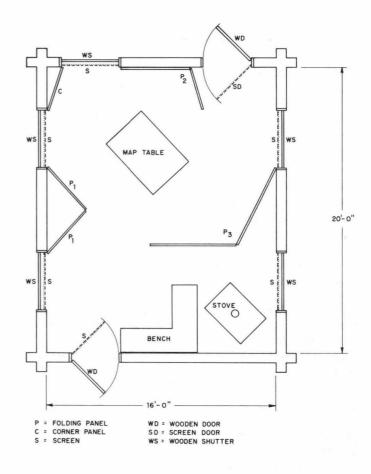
PROPOSED FLOORPLAN FOR THE DISPLAY CABIN.
